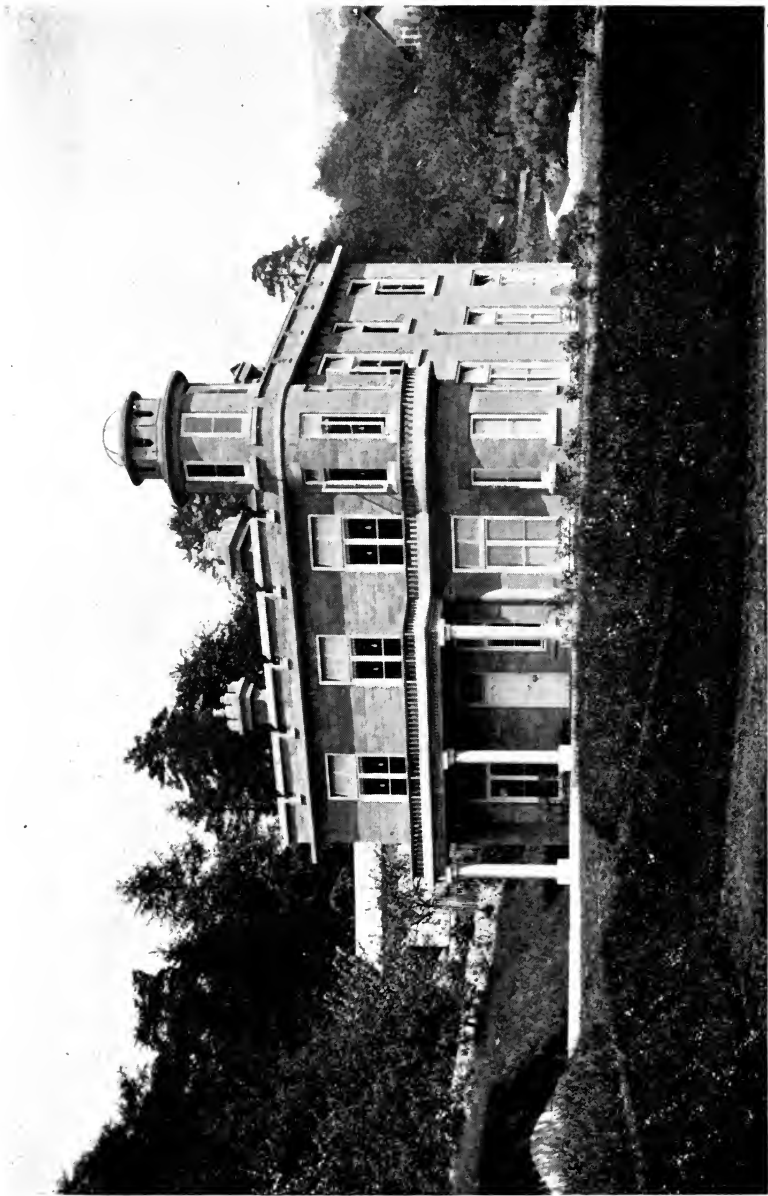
House designed and constructed by Fred and Beatrice Ballard. Walls of hollow concrete blocks 18" long, 9" deep, 6" wide. Solid floors and roof reinforced with $\frac{1}{2}$ " round bars and wire. Built in 1907.
